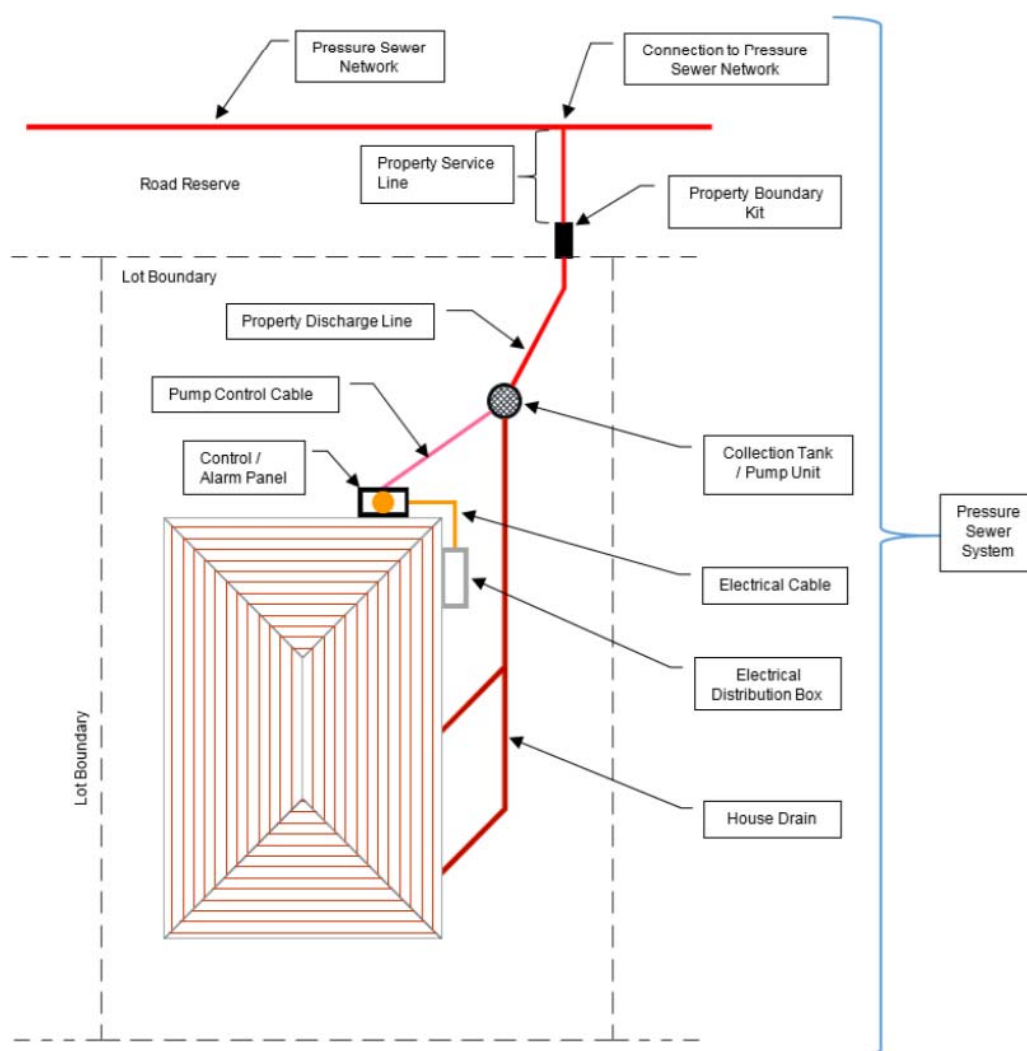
Typical Domestic Installation for a Pressure Sewer
